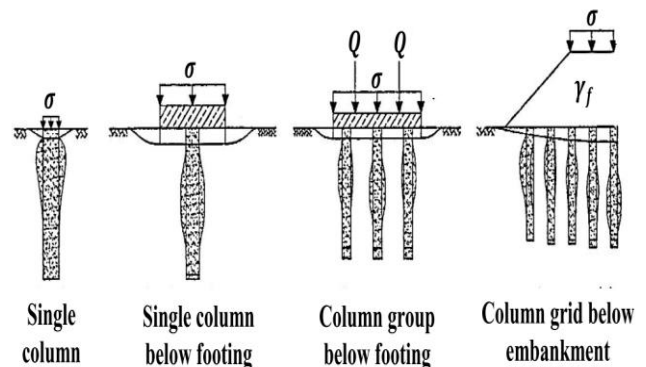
Typical failure of the single stone column (Ghanti & Kashiwal, 2008)
